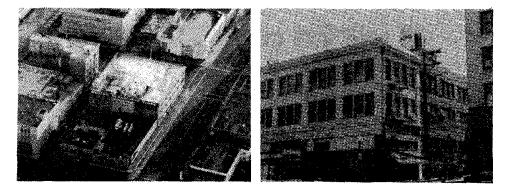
Failure of heavy precast concrete non-structural panels which formed part of the exterior wall, at J.C. Penney building.
